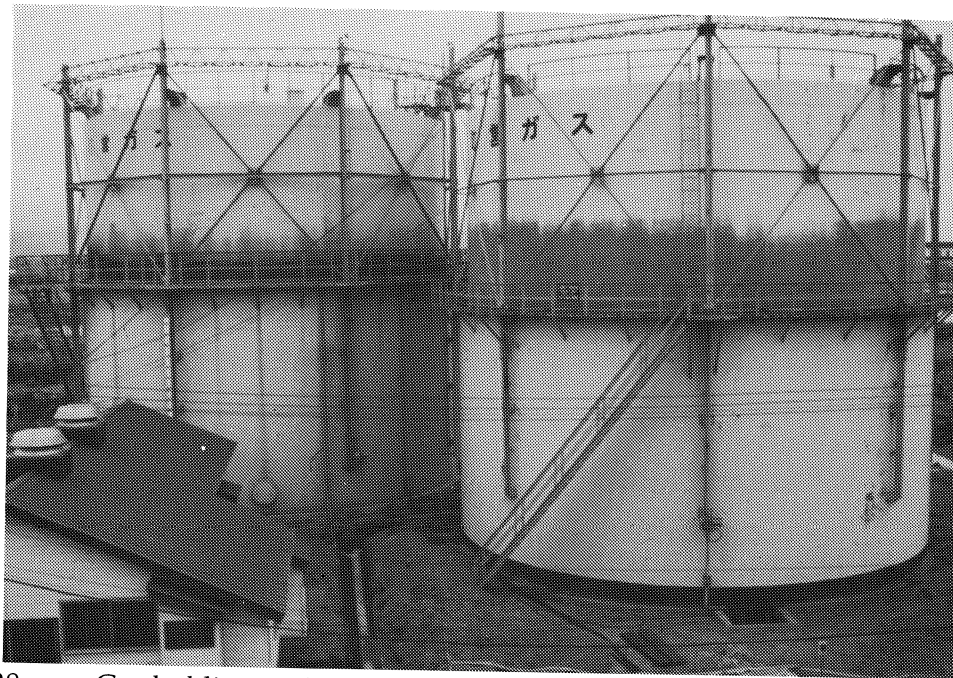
Gas holding tanks in the Oshamanbe area on soft soils. The tanks are not damaged, but the underground piping has been damaged by ground settlement, which can lead to total loss of the tank contents. Note the excavated piping. Similar damage was observed throughout the affected area.
